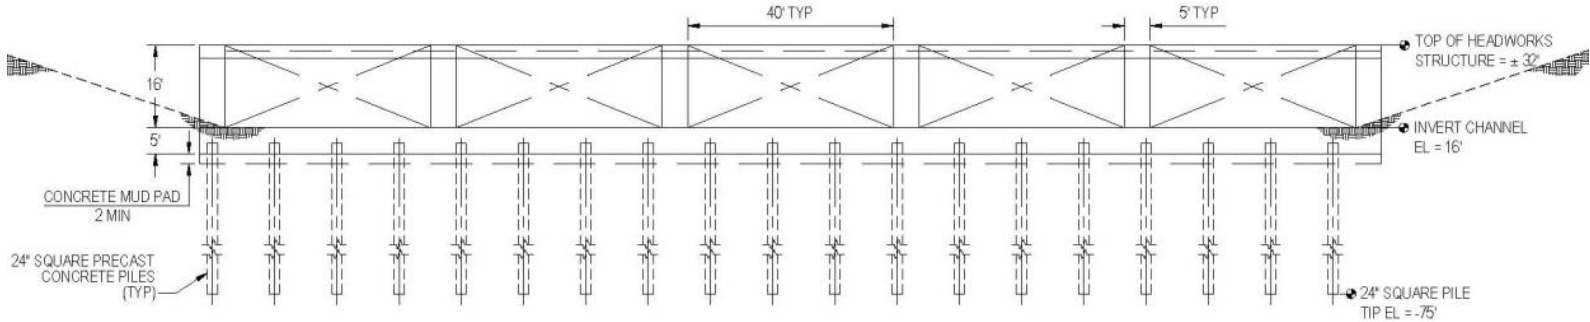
Alternative 6 Headworks Cross Section (view from river side)
